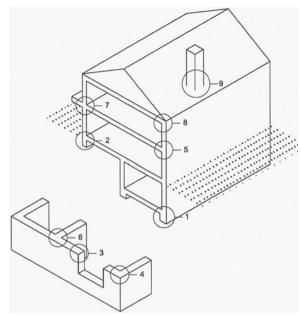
Typical occurrence of thermal bridges in a building. (Source: Olsen and Johannesson 1996)
